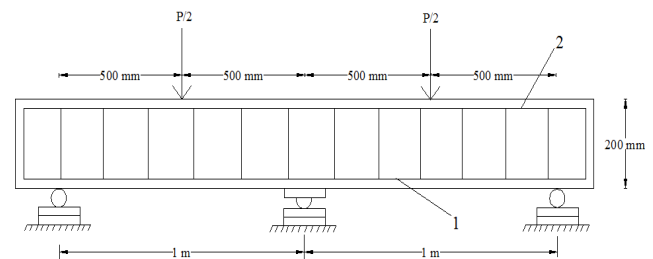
Detailing of reinforcement 1, 2 – top and bottom steel reinforcement
